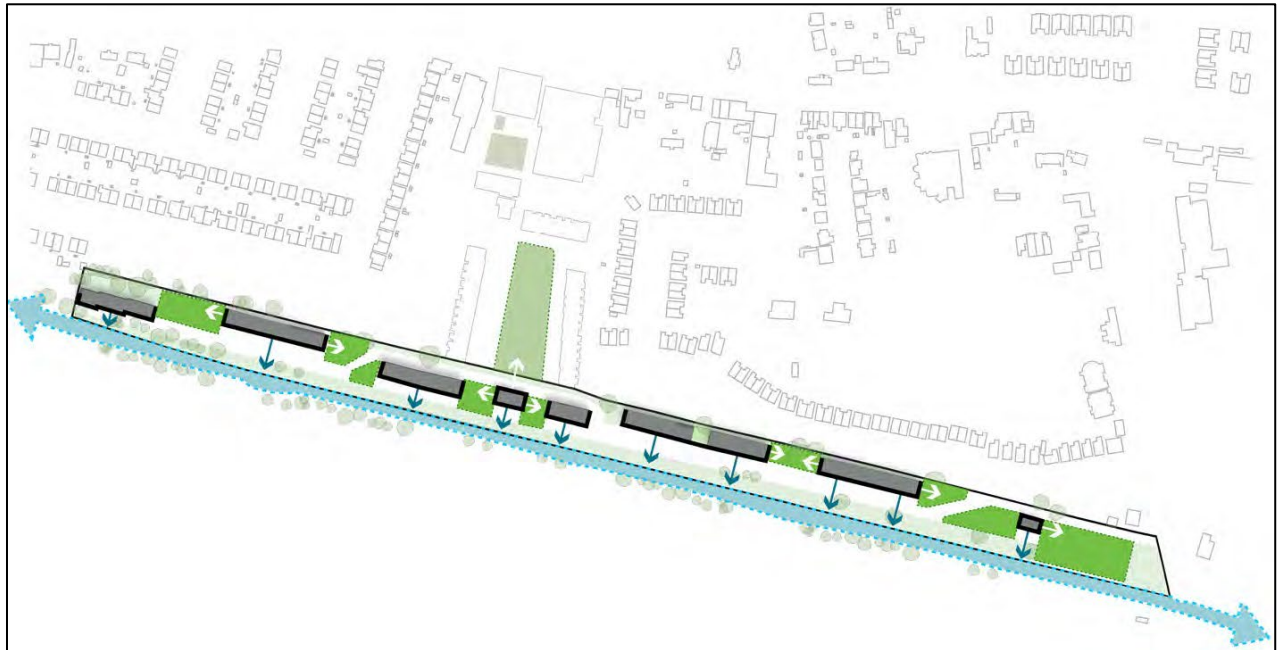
Proposed Land Uses (Extract from Figure 5-3 of the Draft Old School House Masterplan, FCC 2025)
